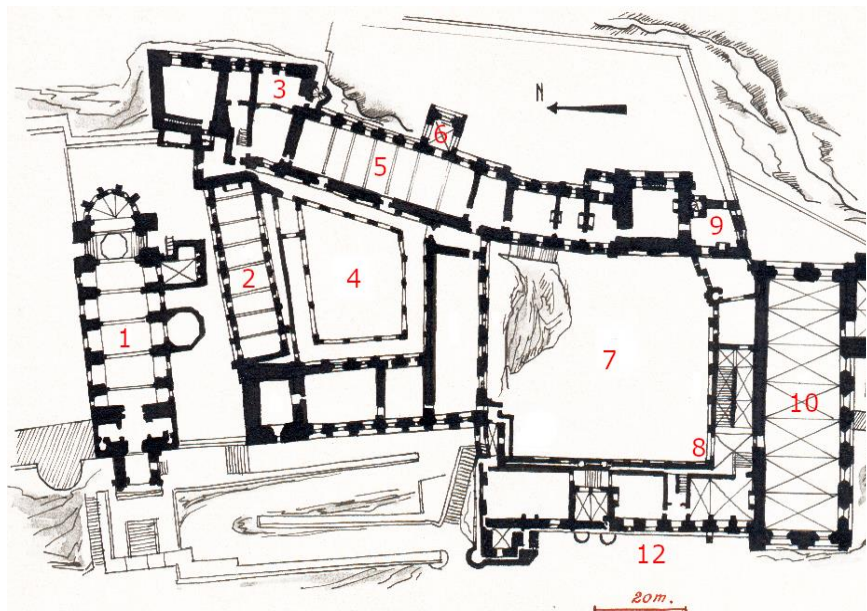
Floorplan of the Palais des Papes in Avignon. Source: adapted from original drawing by Viollet-le-Duc (1858, vol. 7, 32).
